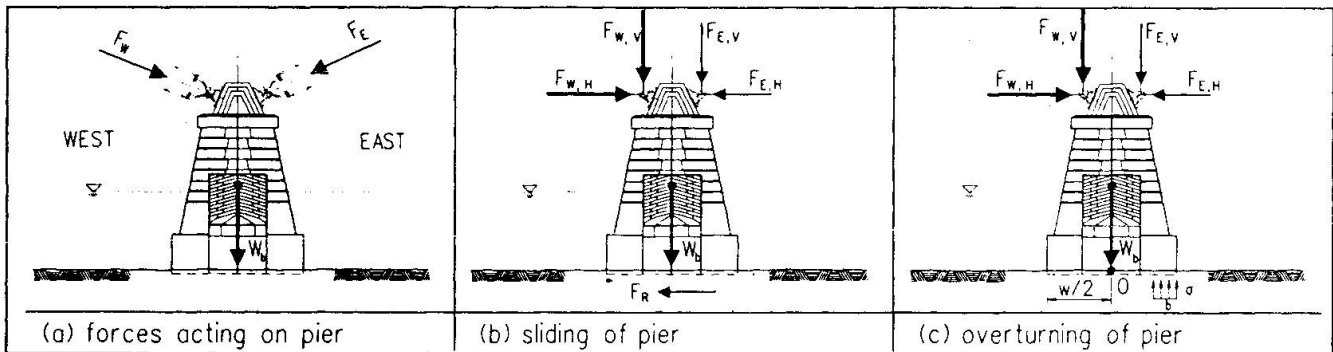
Sliding and Overturning Forces Acting on a Typical Pier
